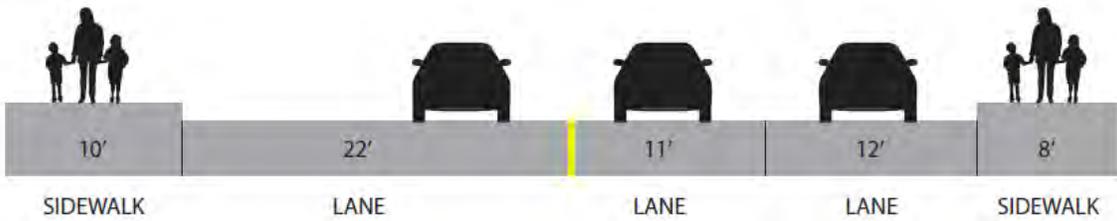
2nd Street West of Hetherton Street – Cross Section
